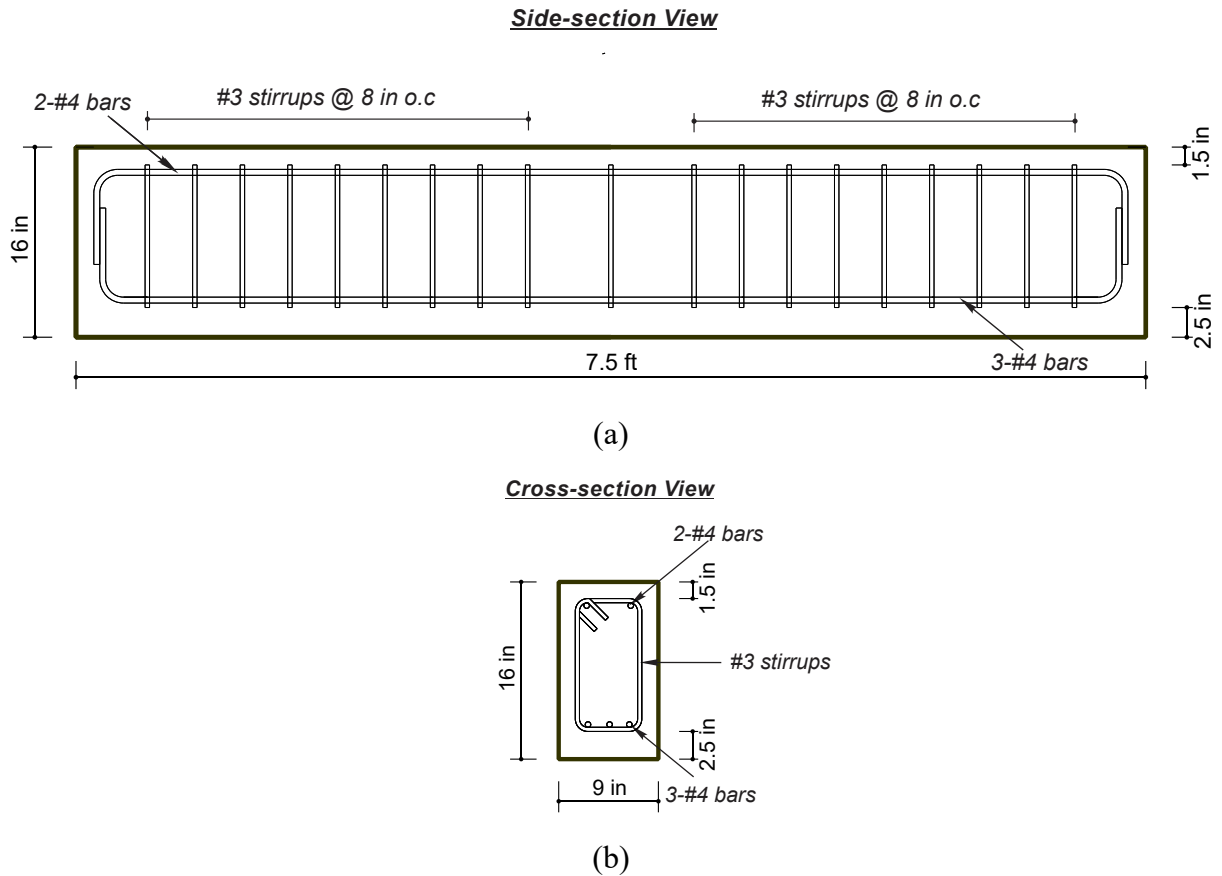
Design details of reinforced concrete girders: (a) side-section view; and (b) cross-section view.
